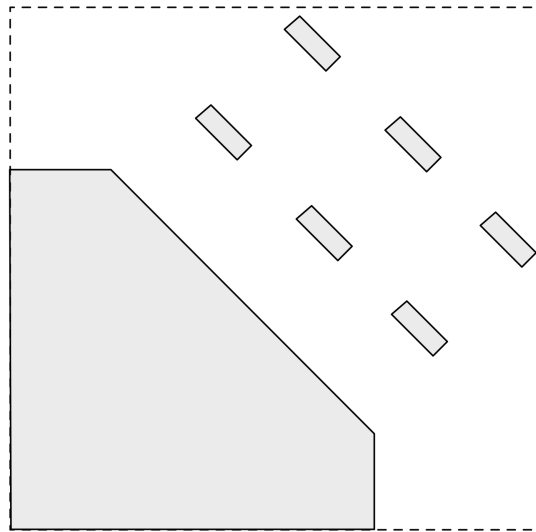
The ground plan of Project 4, the roof for a gas- or bus-station.
